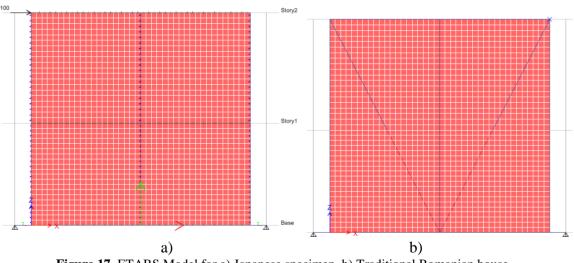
ETABS Model for a) Japanese specimen, b) Traditional Romanian house
